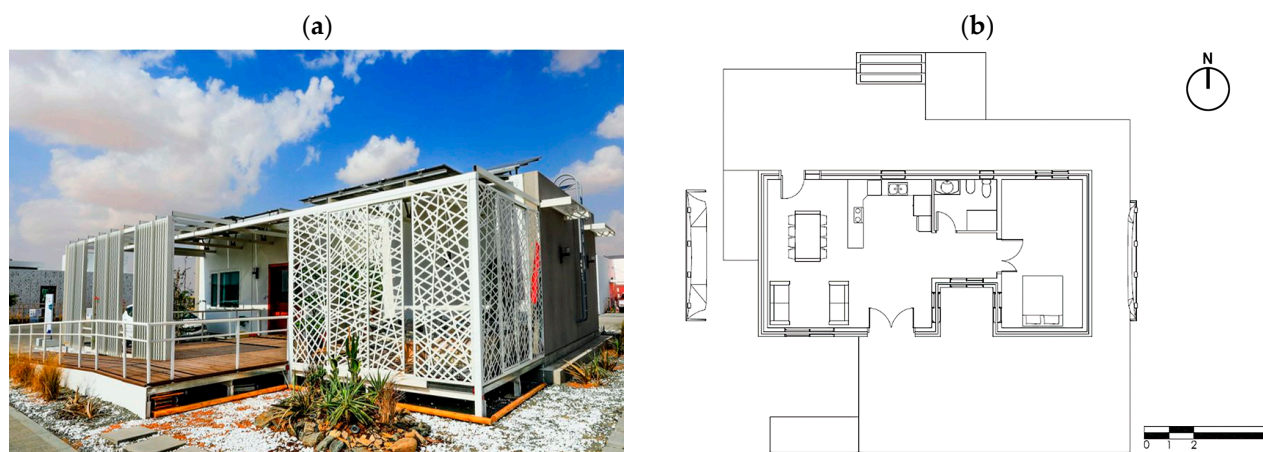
Team Aqua Green's house. (a) Exterior photo. (b) Floor plan. (Photo: SDME 2018 Organization. Floor plan: by authors based on team Aqua Green drawings).
